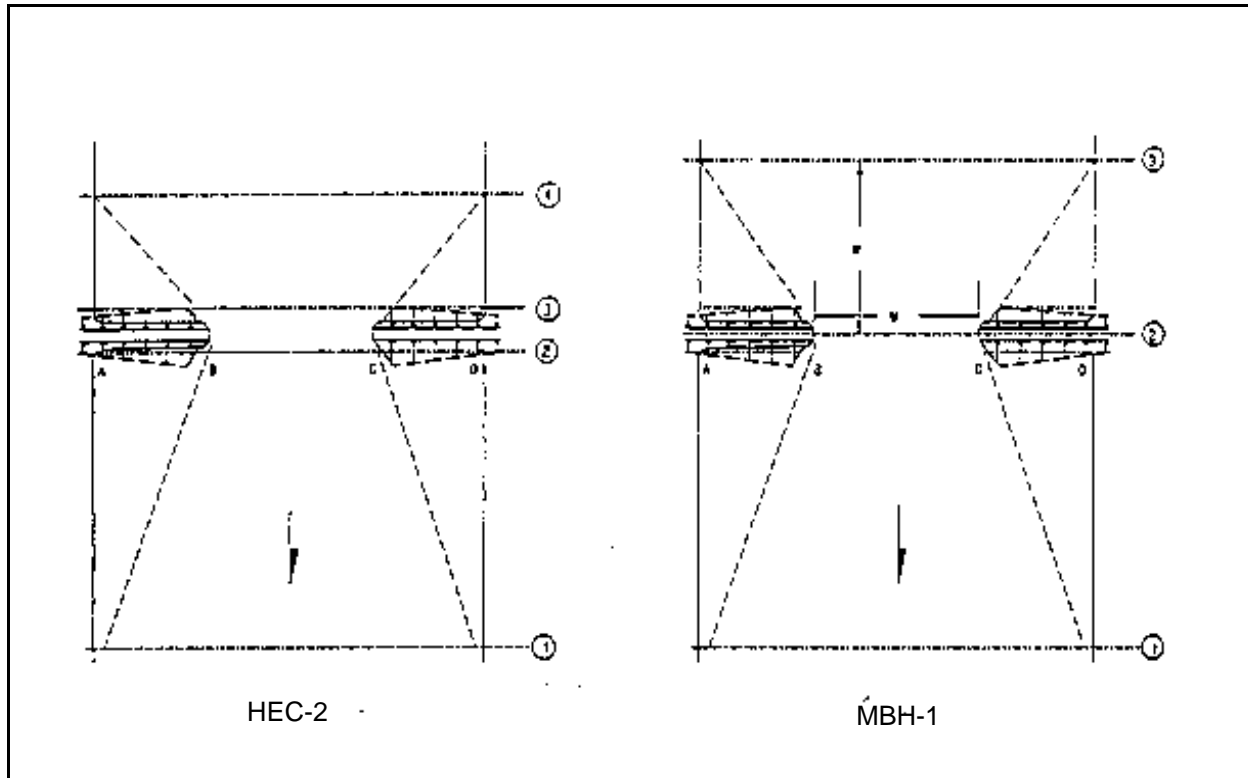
Cross Section Layout at Bridges, HEC-6T.
